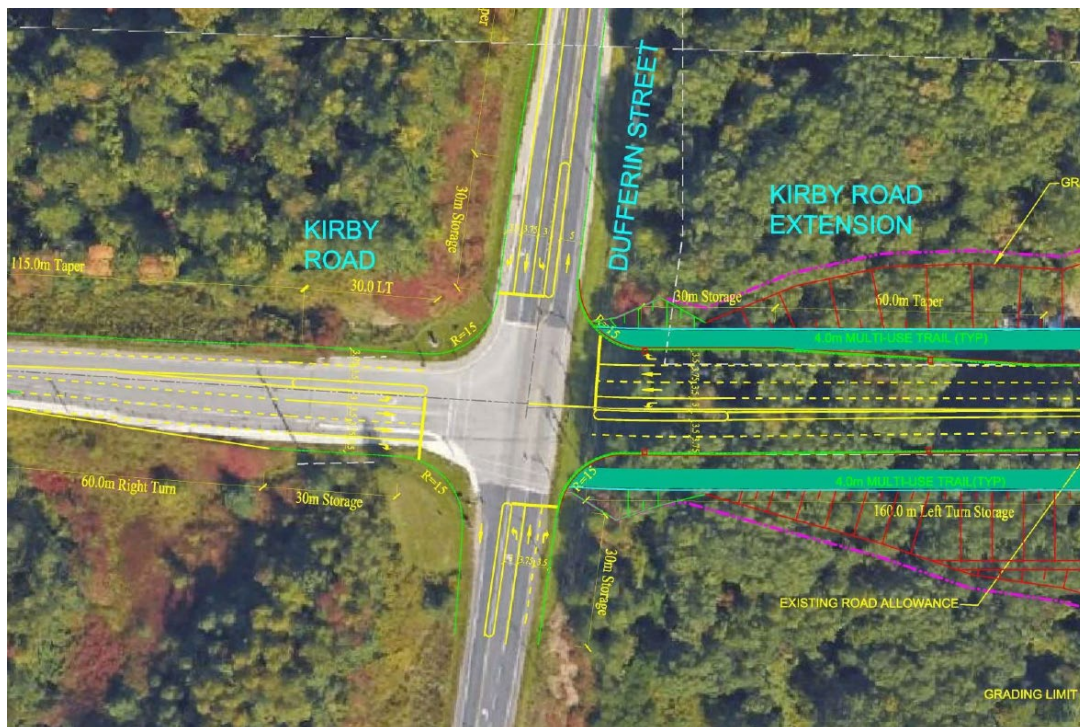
Kirby Road Extension EA - Refined Preferred Alternative
